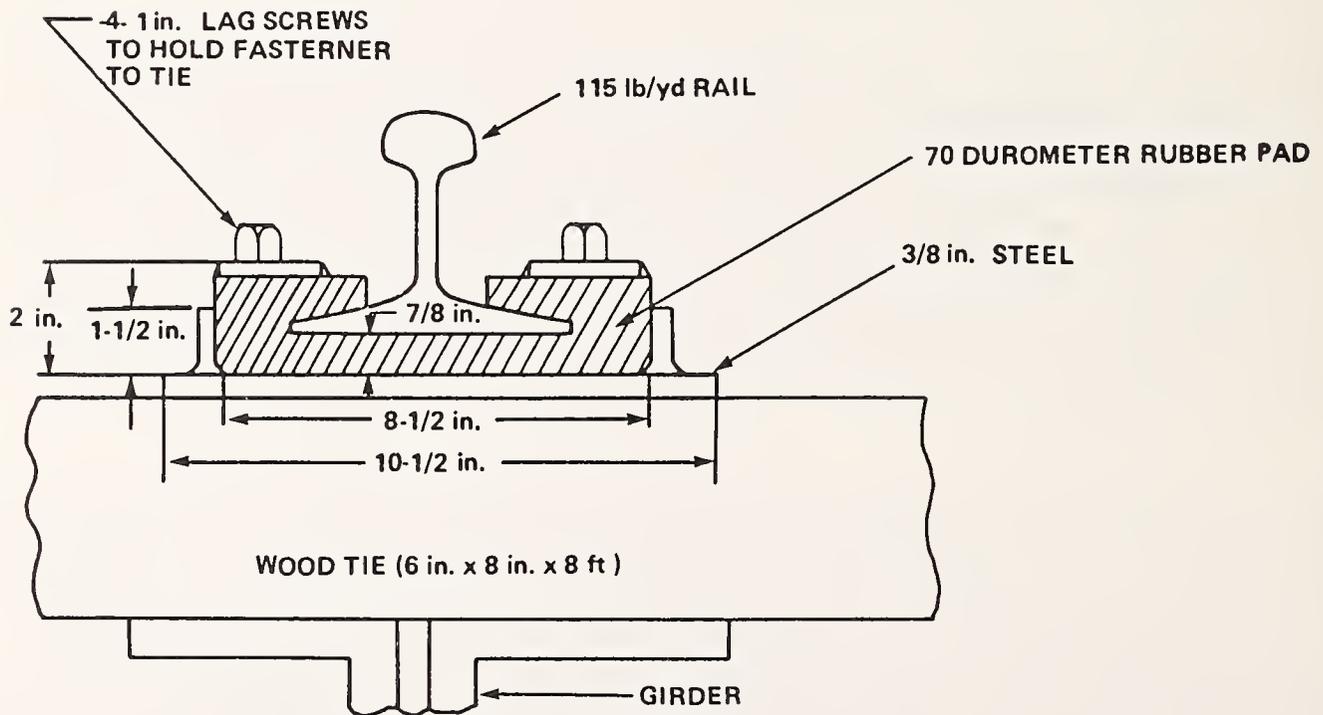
RESILIENT FASTENER USED ON THE 10TH AVENUE NYCTA ELEVATED STRUCTURE
